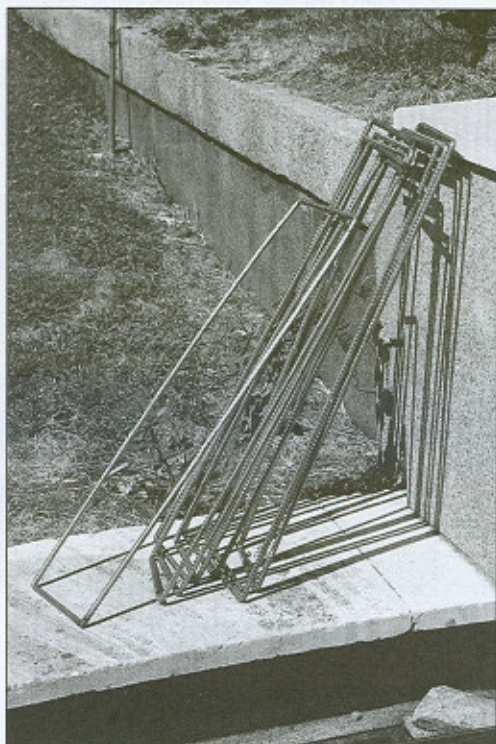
BEKAERT bed joint truss reinforcement, type Murfor RND 5/S-200mm.
